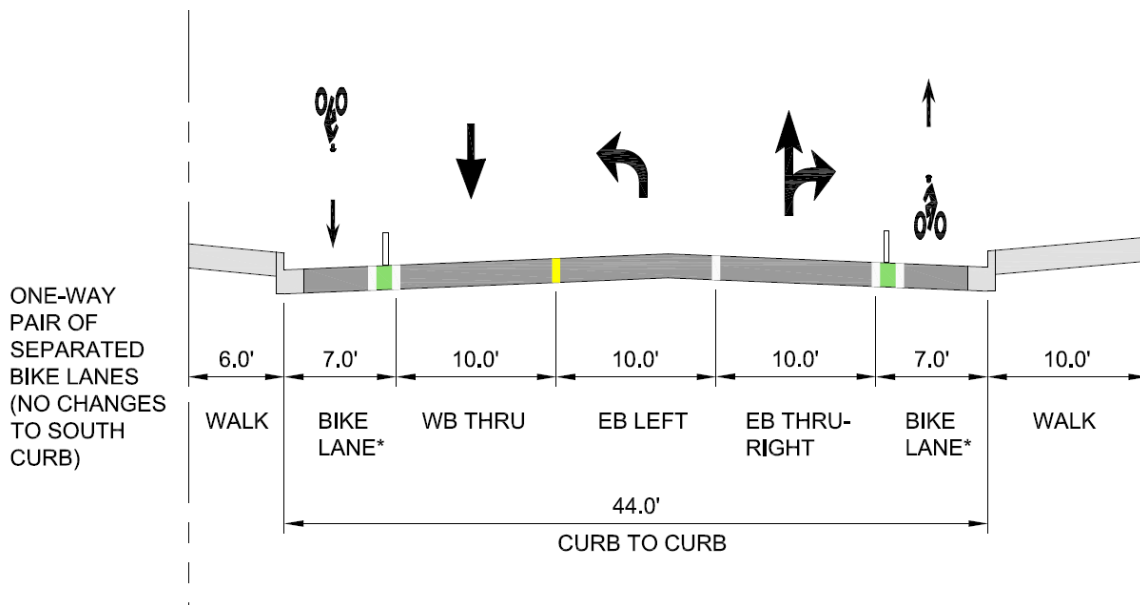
Proposed Cross-Section Option B; McClellan Road West of Bubb Road
